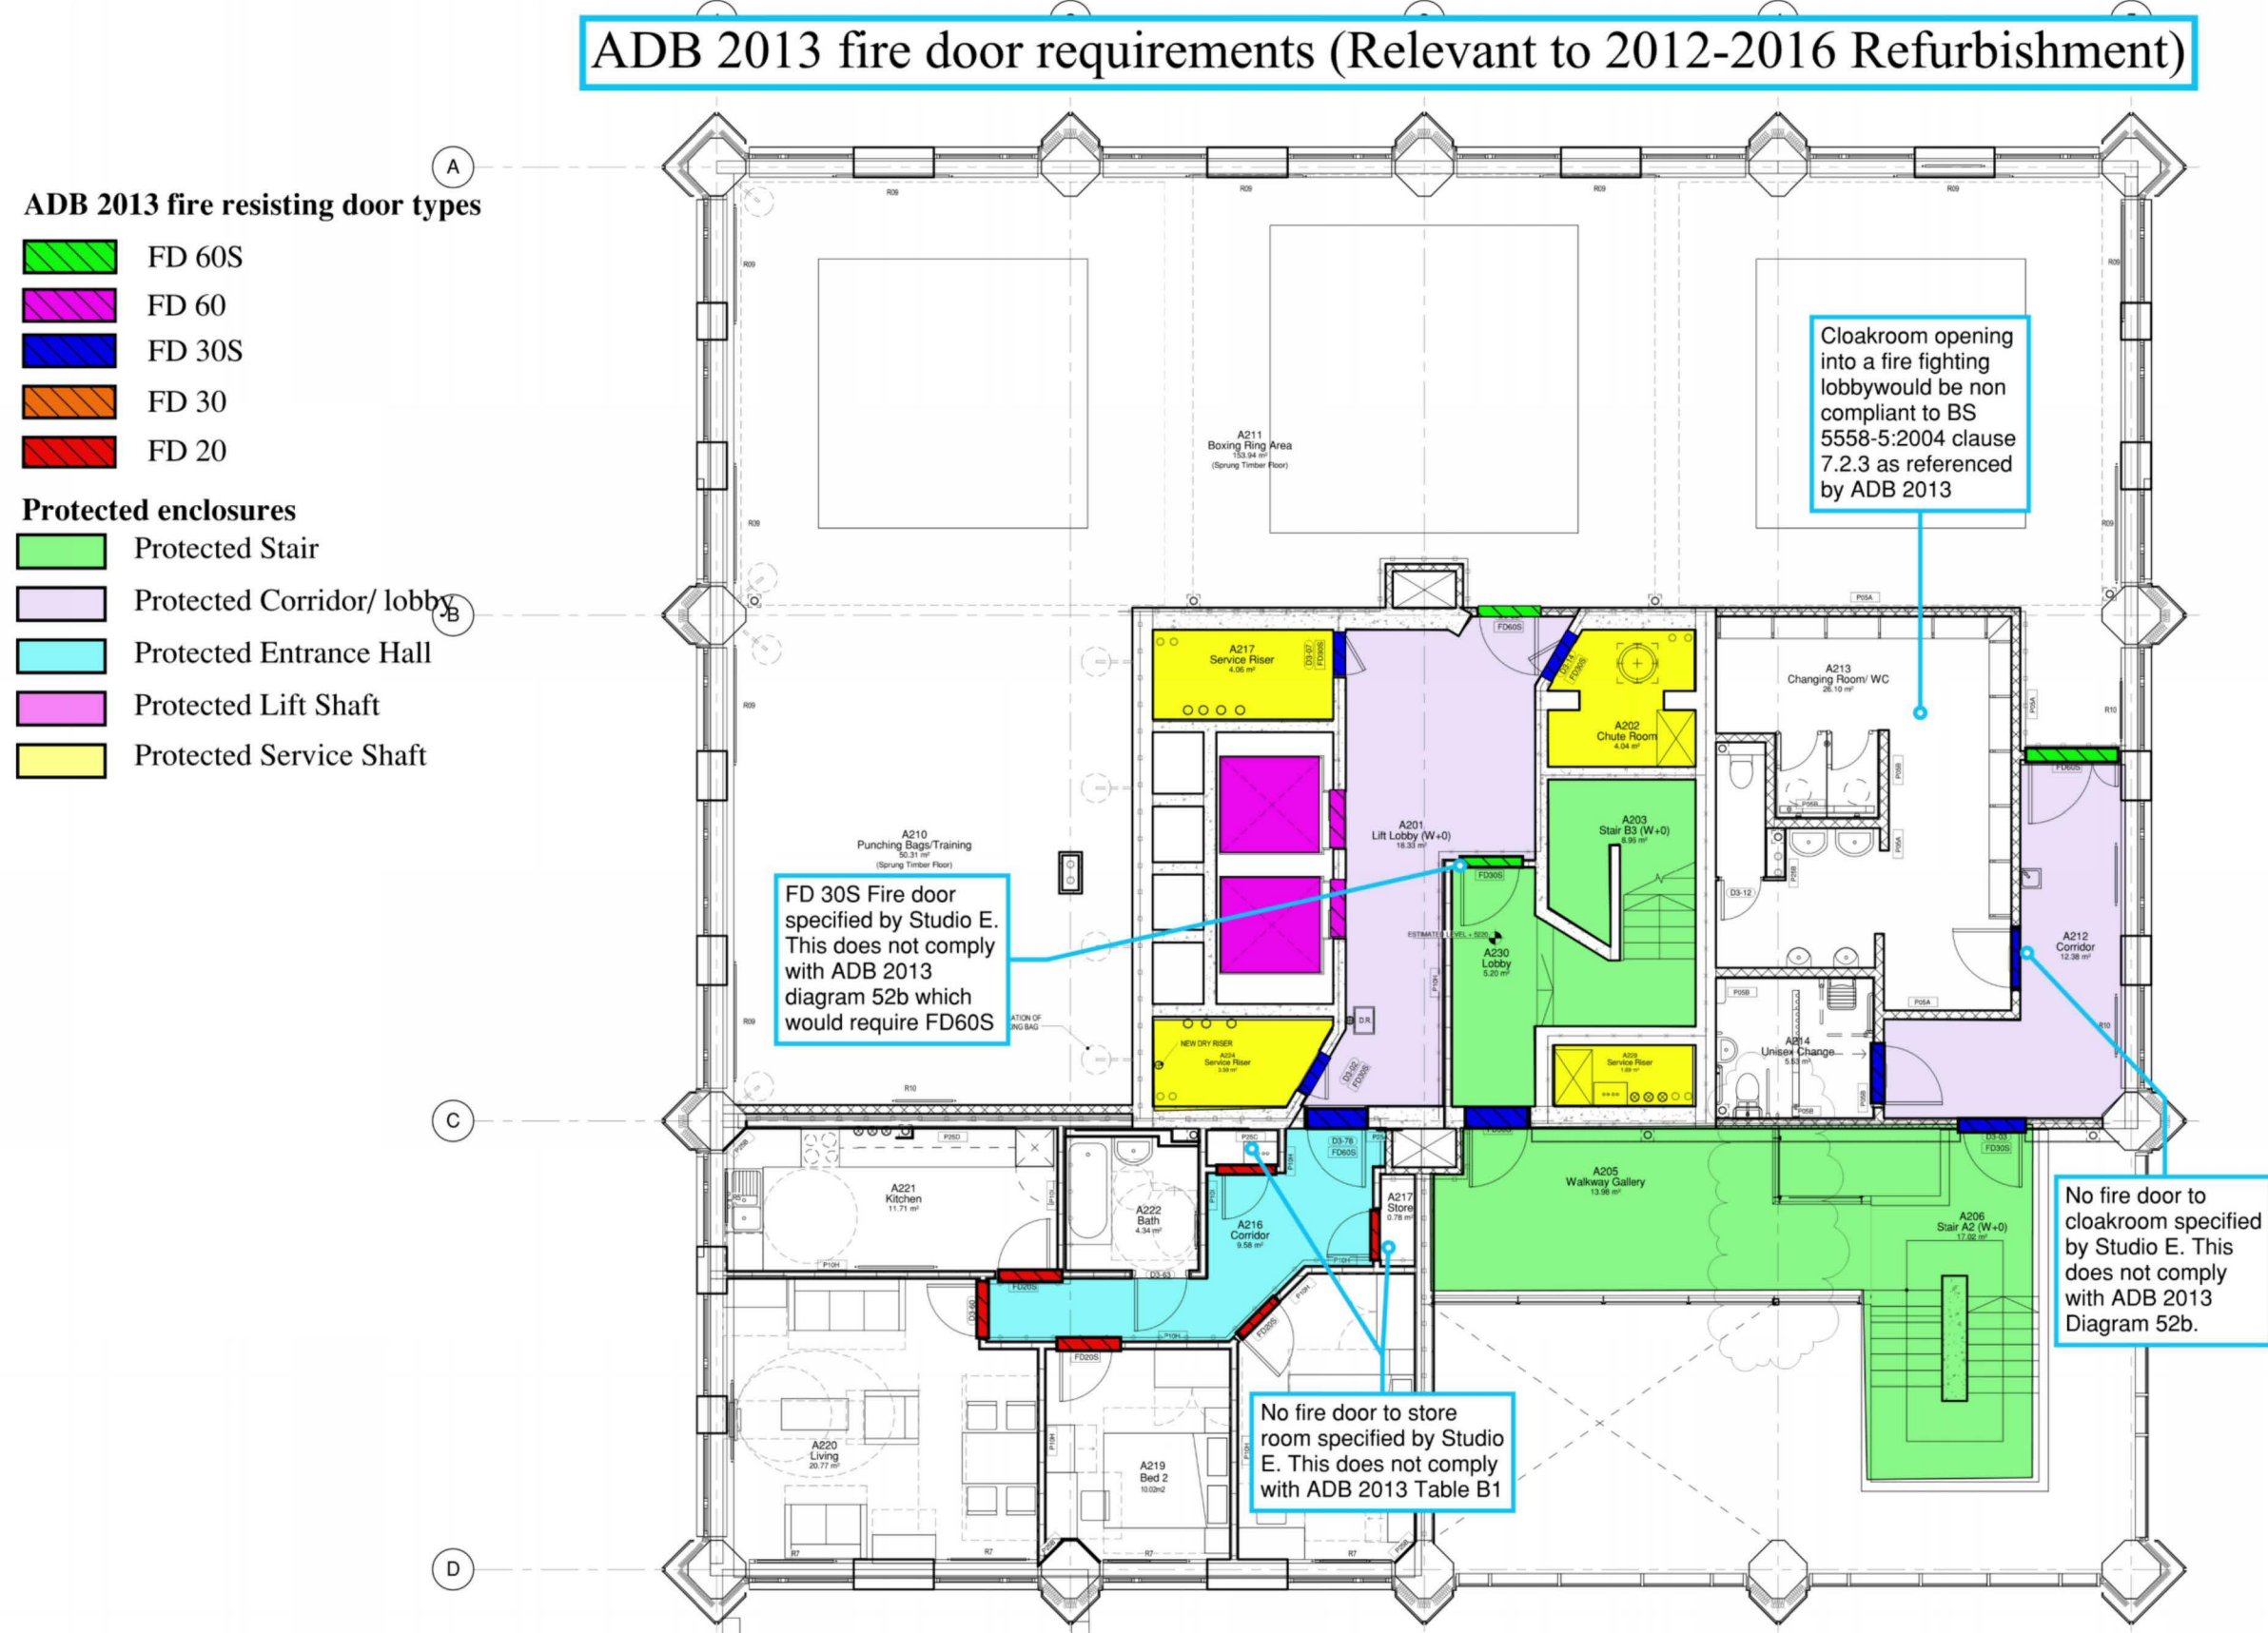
Indicative over marking of ADB 2013 compliant fire doors on the Studio E as built level 2 floor plan (SEA00003149)
